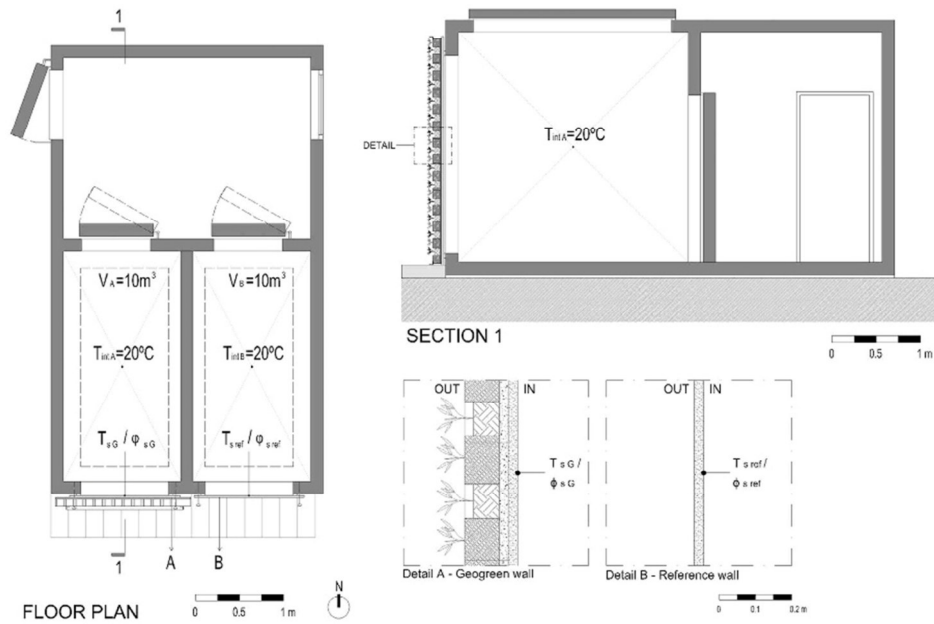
Test cell plant and section with probes positioning. A. Geogreen wall; B. Reference wall.
